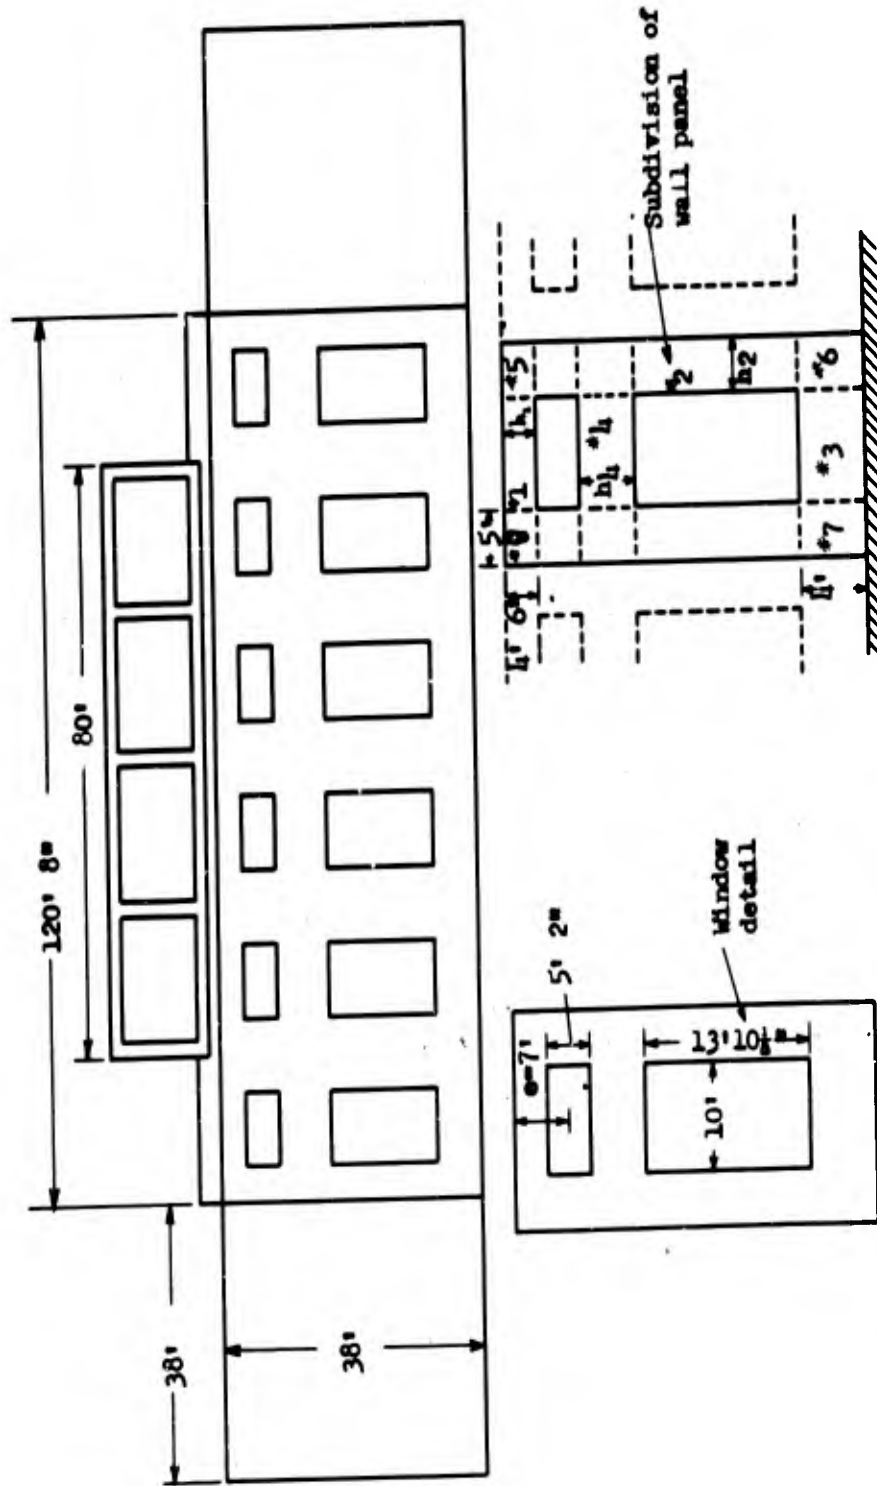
Front Wall of Building 3.3.3 (Building 3.3.8a is 1/4 of size indicated)
